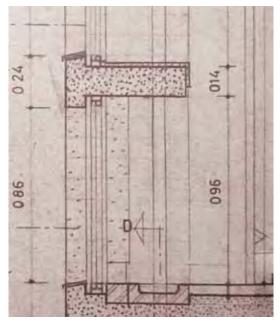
Detail section BB (Antwerp: deSingel).
